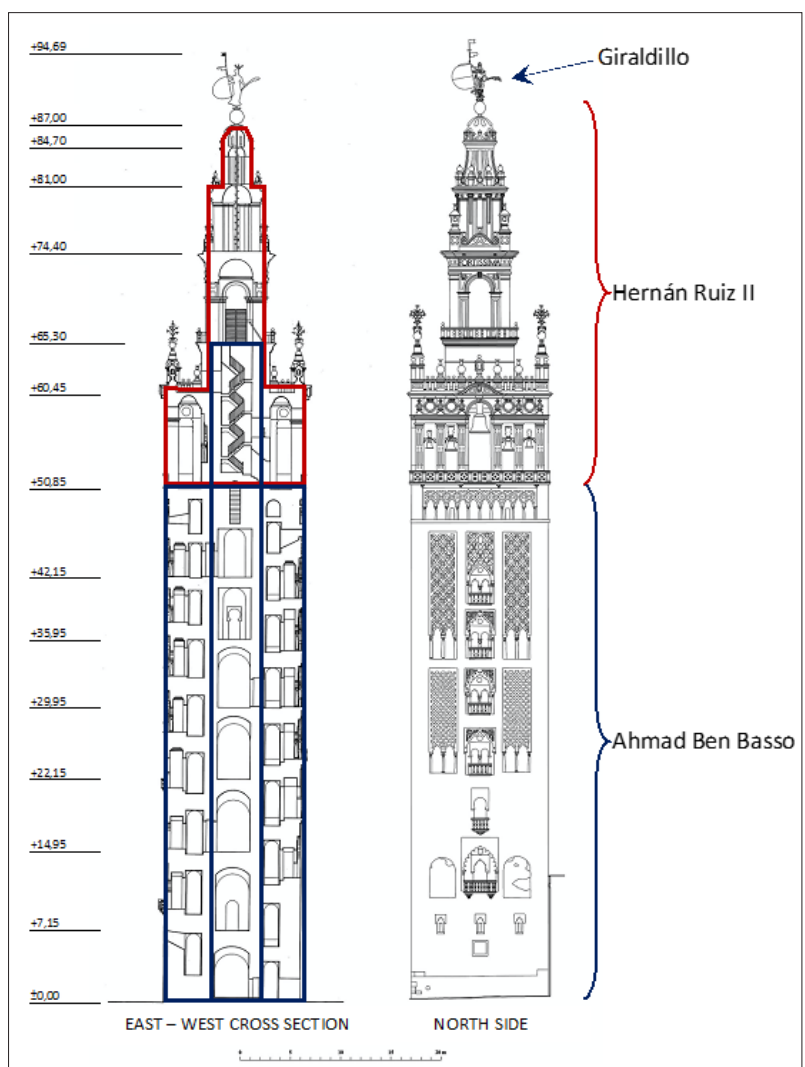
Cross section and north elevation, indicating the heights and the action areas of the two builders involved in the bell tower construction (graph by the author over plans by Almagro Gorbea [9]).
